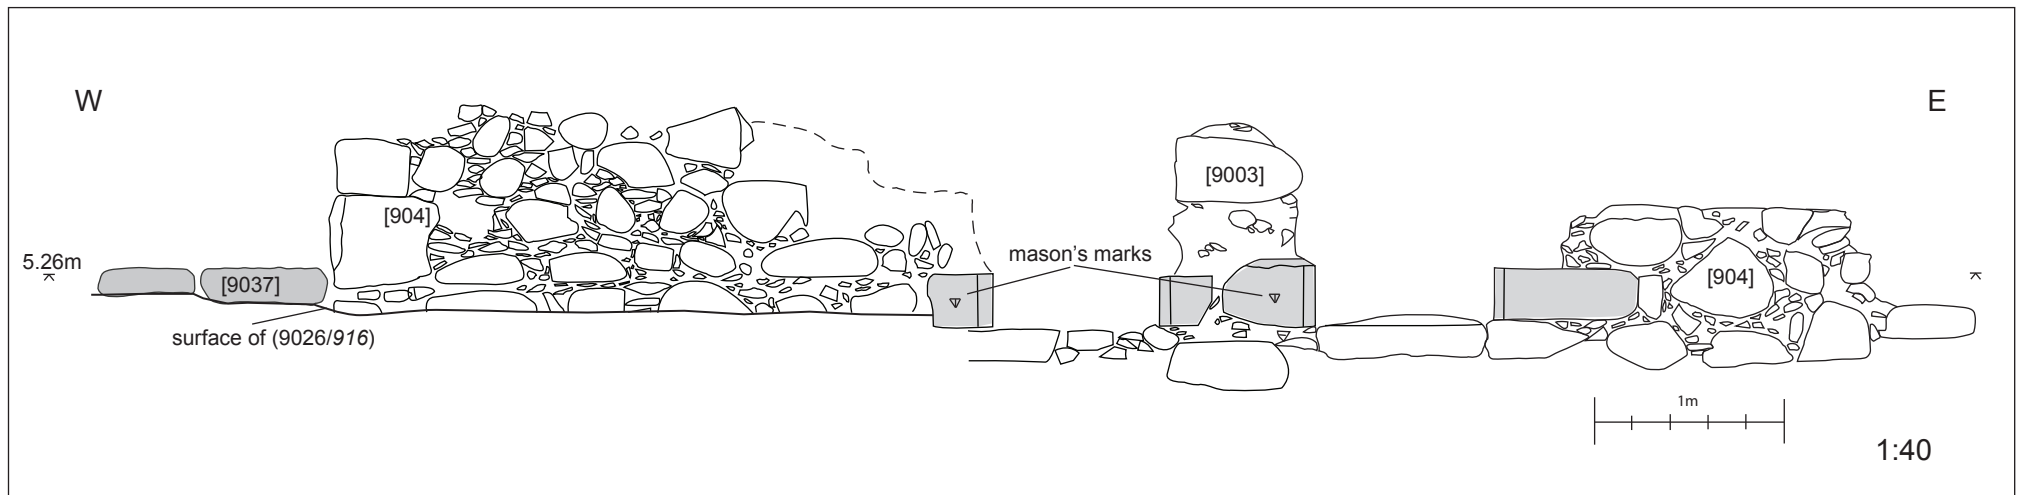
Elevation of surviving stretch of front (south) wall [904] showing doorways and position of masons marks
